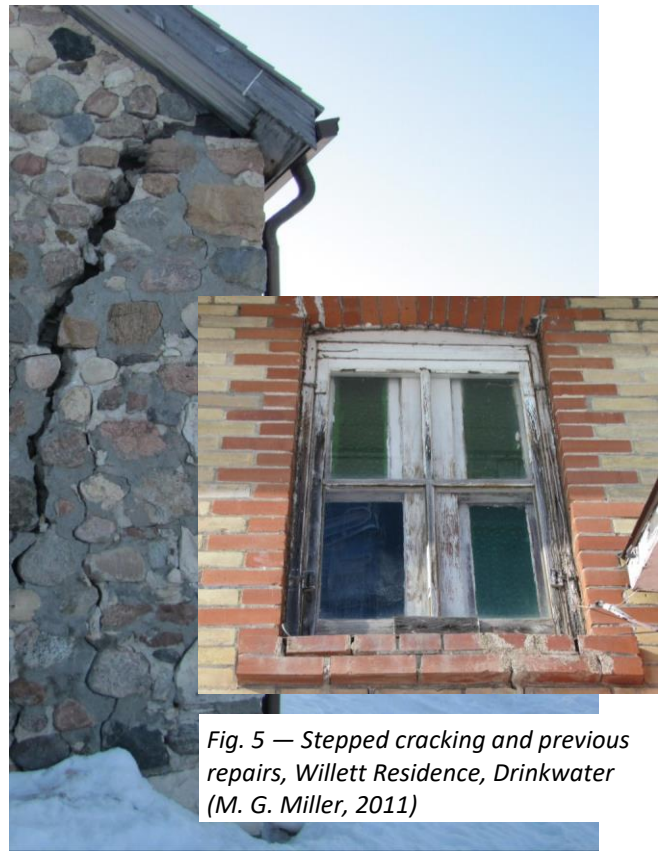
Stepped cracking and previous repairs, Willett Residence, Drinkwater (M. G. Miller, 2011)
